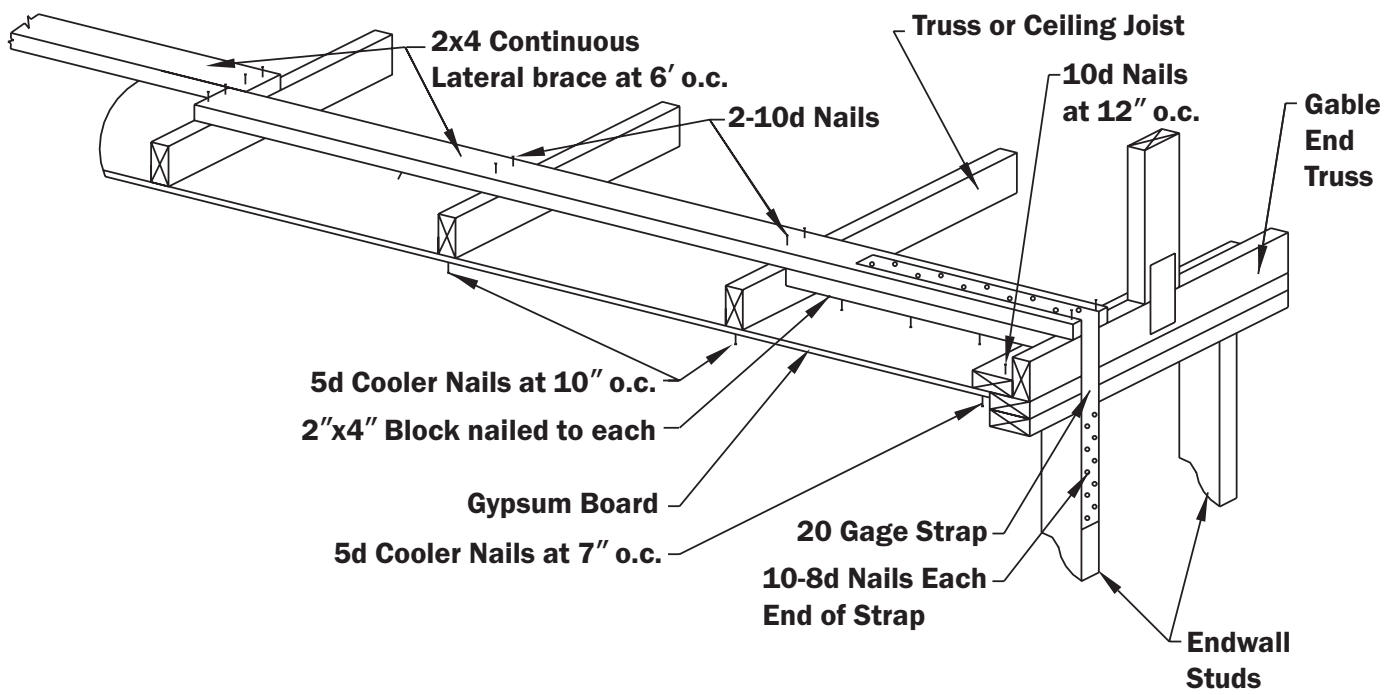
Floor Bracing Endwall (Floor or Roof)
